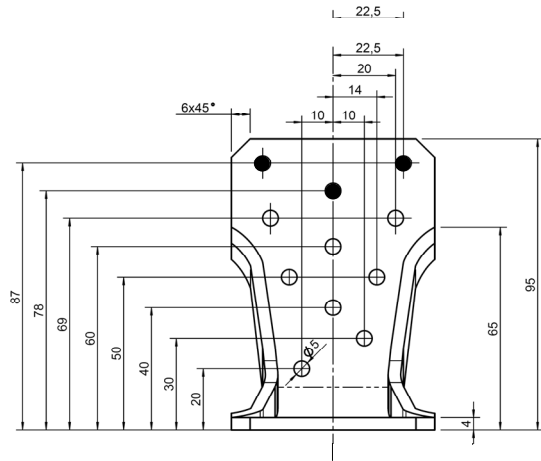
Nail Patterns of Angle Bracket KR 95 – column connection
